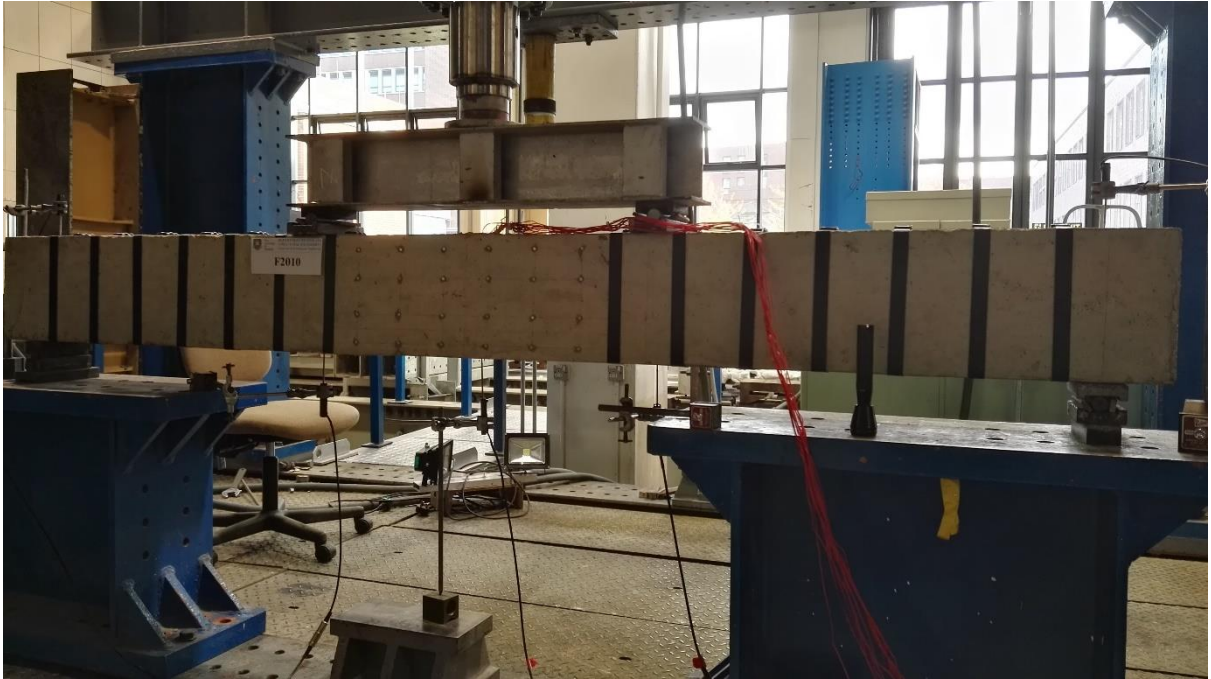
Testing and metal straps arrangements for all beams reinforced with 10-mm rebars.
